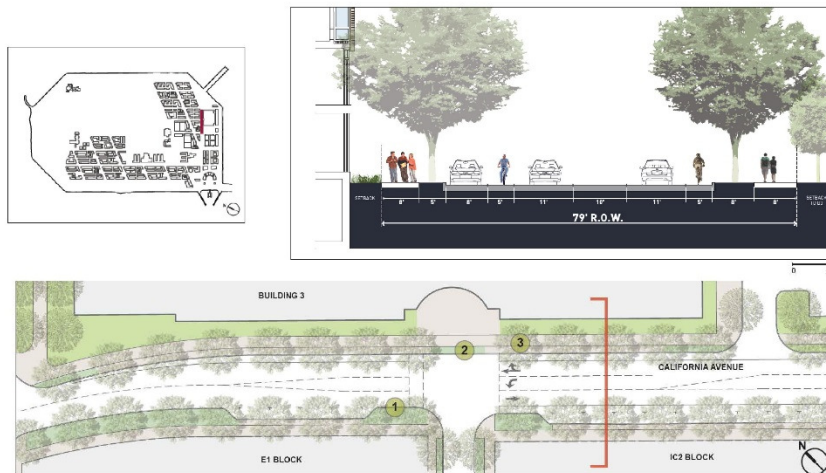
n: Illustrative California Avenue B3 Block Streetscape Plan
